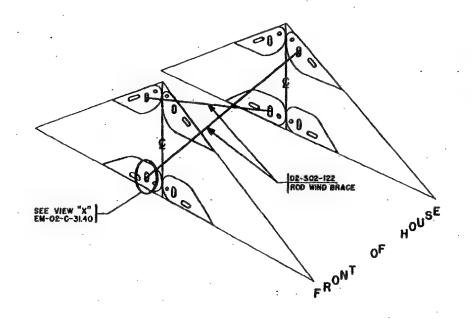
DETAILS-TRUSS-WIND BRACE & WALL TIE-IN
